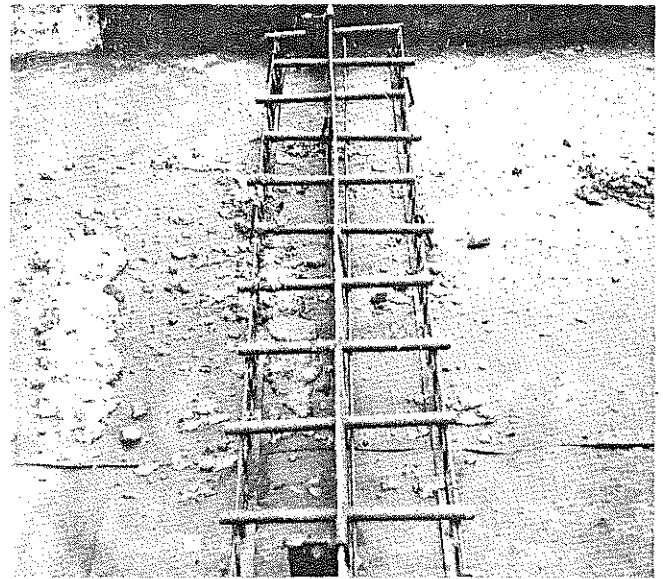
A view of the conventional or standard contraction joint, with dowel bar load transfer assembly, that was used in the normal joint construction.
